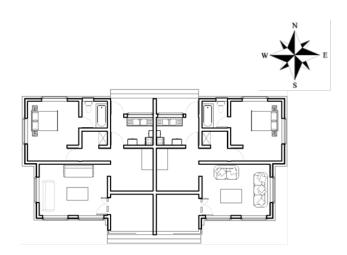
Floor plan of the proposed residential building in Lagos, Nigeria
